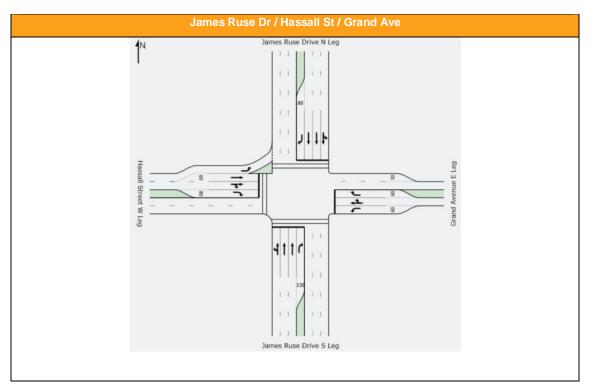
Intersection Layout - James Ruse Drive / Hassall Street / Grand Avenue (Source: AECOM, 2012)
